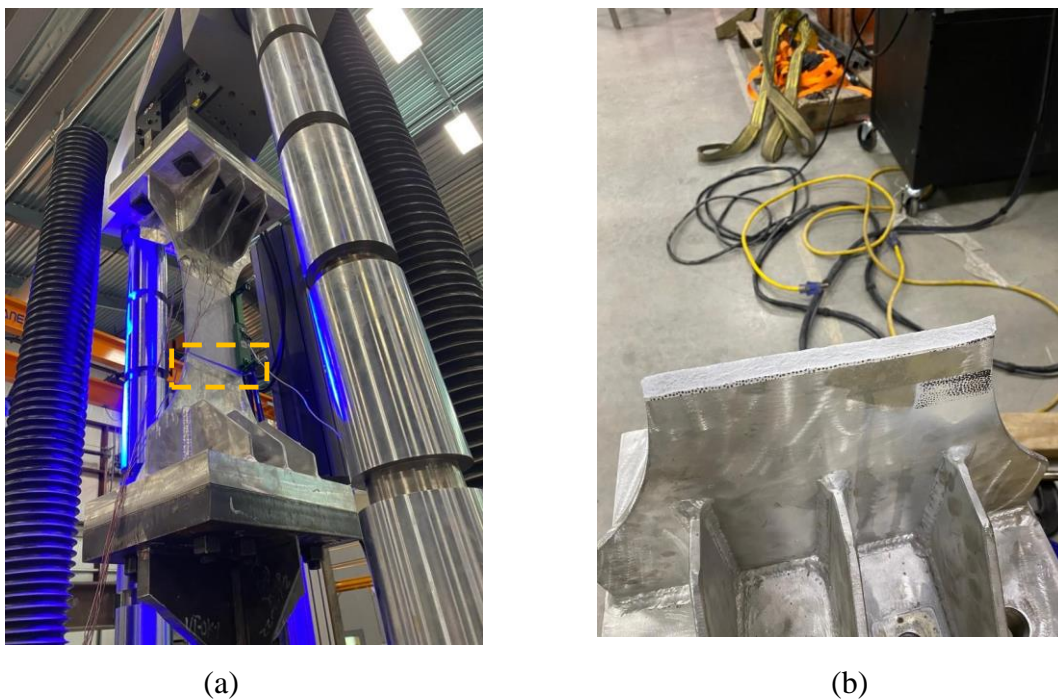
Initial test specimen after failure: (a) general view and (b) close up view of the fracture surface.
